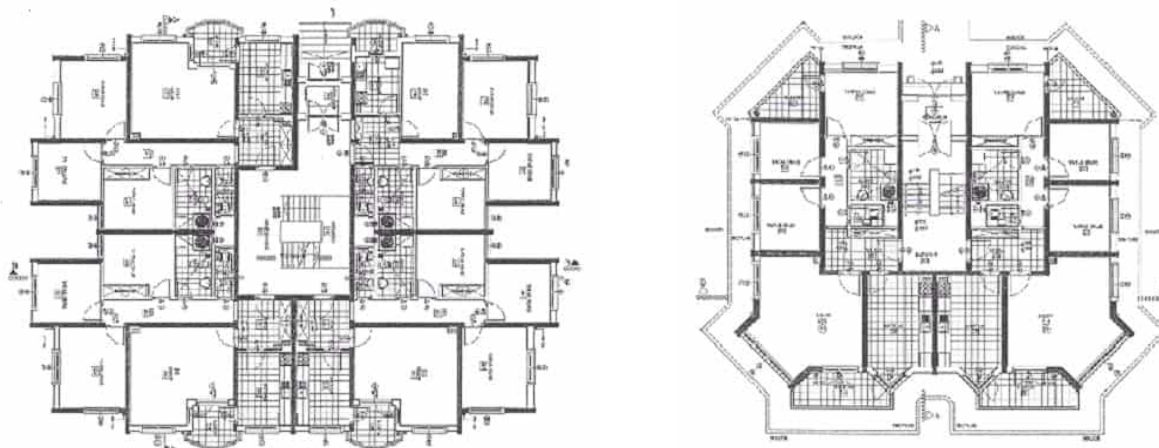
Floor plans of Subaşı permanent houses (Source: Personal archives)
